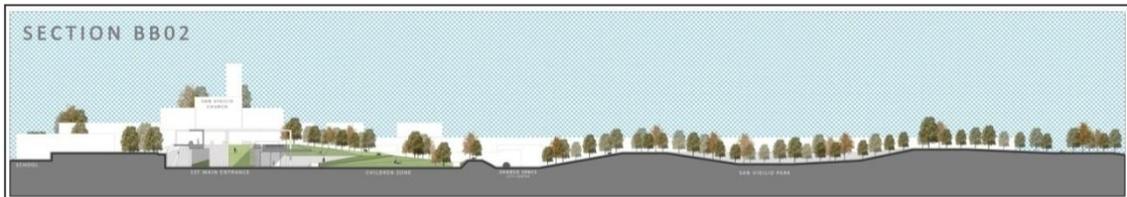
Final Proposal Section BB02 / West Elevation 01
